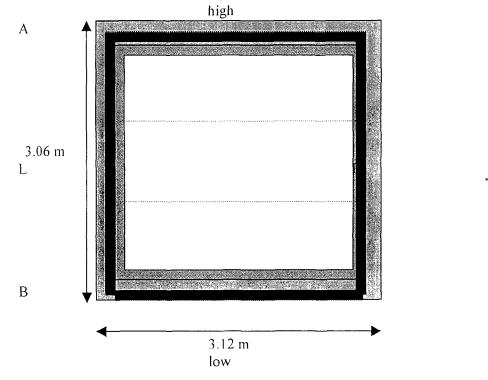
Top view of reservoir with extra masonry wall and beams
